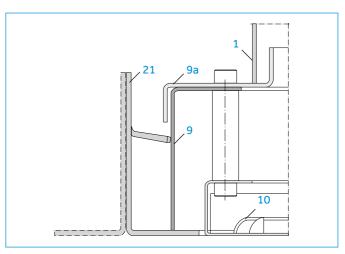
Installation Situation with ceiling installation frame 9 and intermediate profile 9a into a cassette ceiling type
